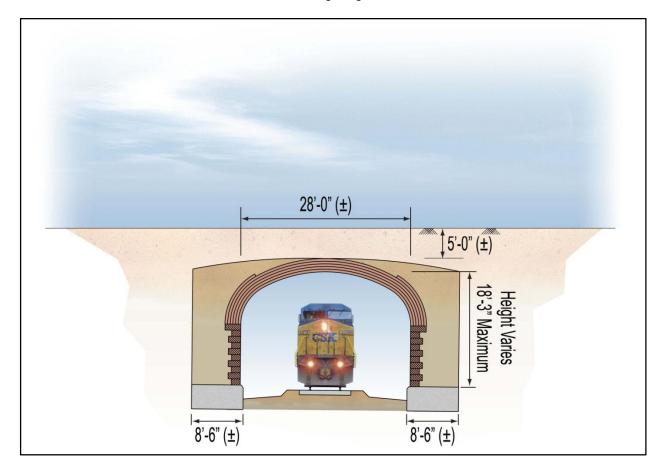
Cross-Section of Existing Virginia Avenue Tunnel
